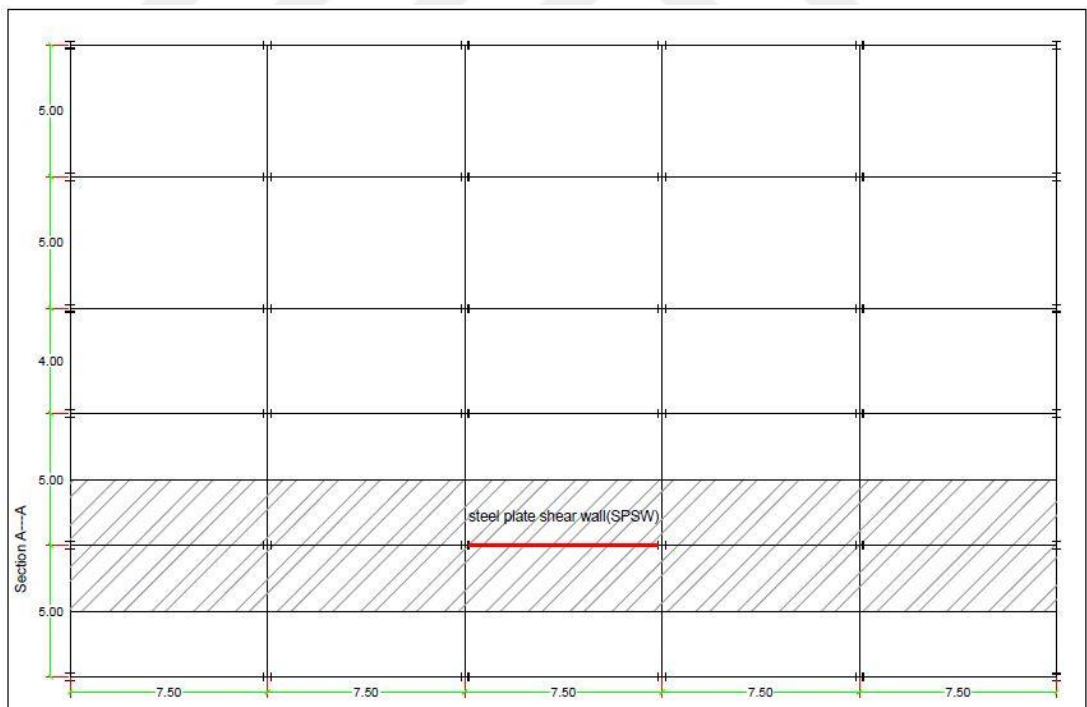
Plan of 4-story building with steel plate shear walls having aspect ratio of 2.142 (Model 5)
